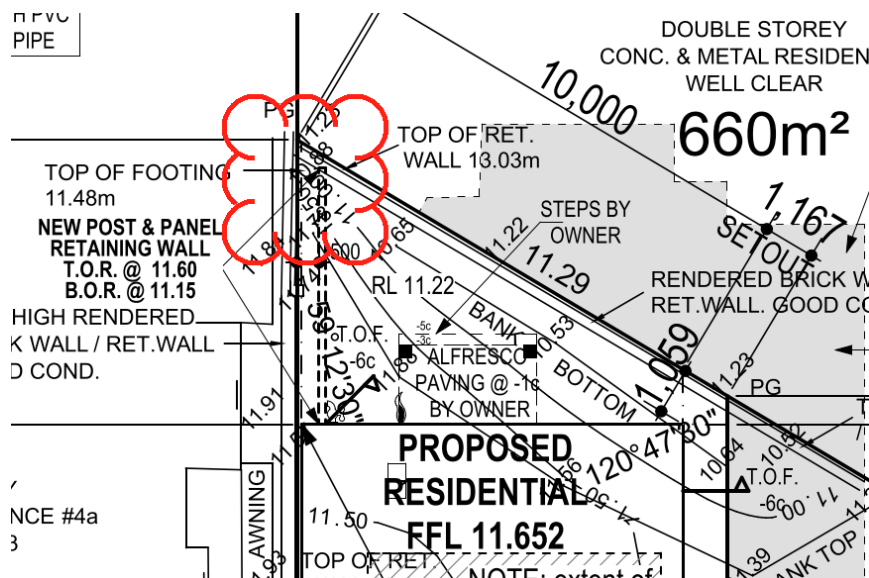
A site plan of the subject application (right) and the neighbouring property (left). The area clouded in red is the proposed retaining that exceeds 0.5m above NGL.
